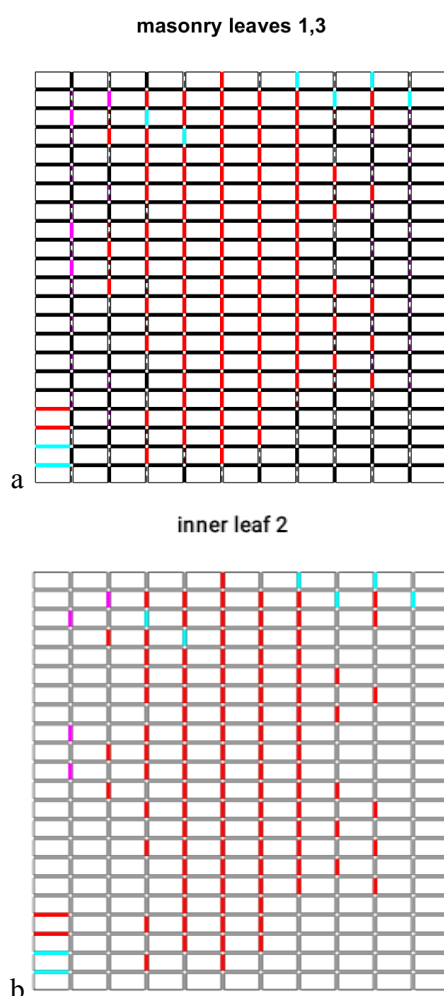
Crack patterns for the leaves of the two-leaf masonry panel (failure types: cyan = tensile, red = shear, magenta = bending)
